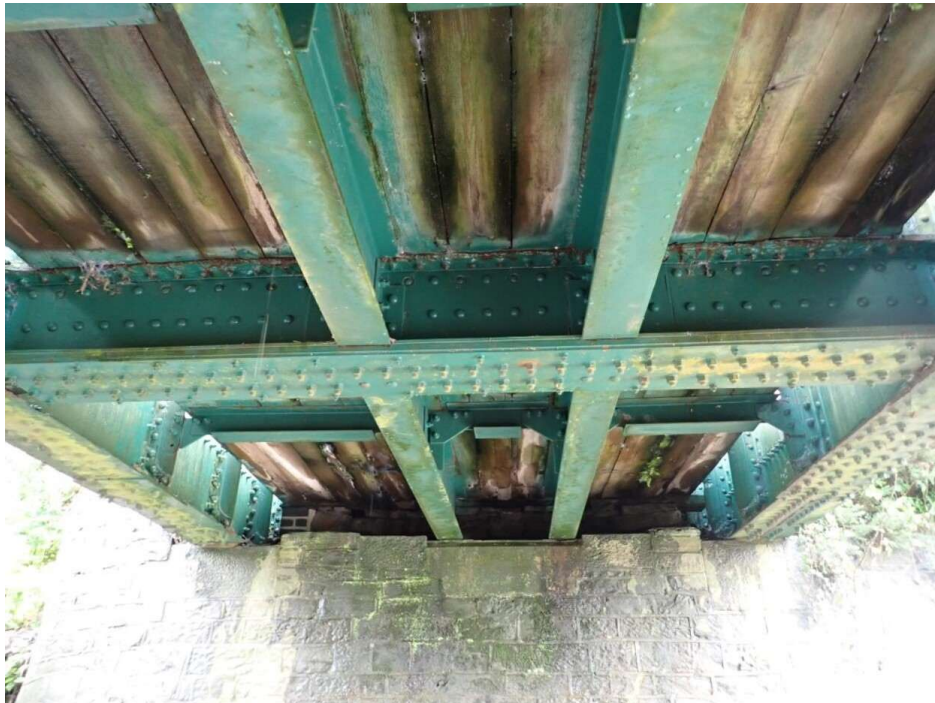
Main Girder 2 Bottom Flange \(28/08/2024\)](#)
